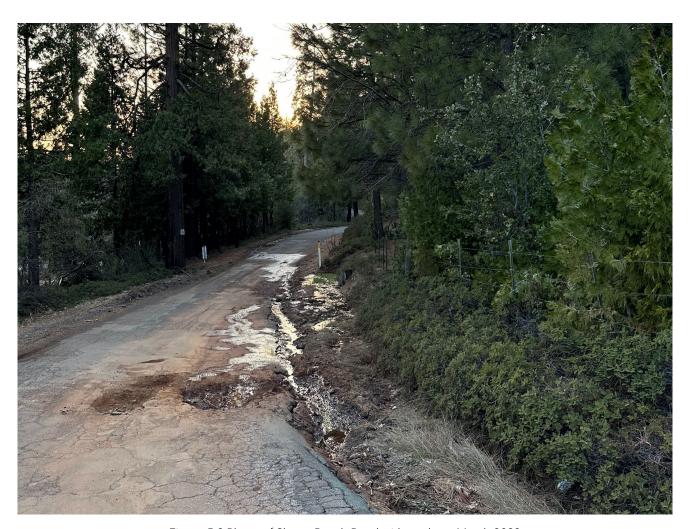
Photo of Sheep Ranch Road with washout March 2023
